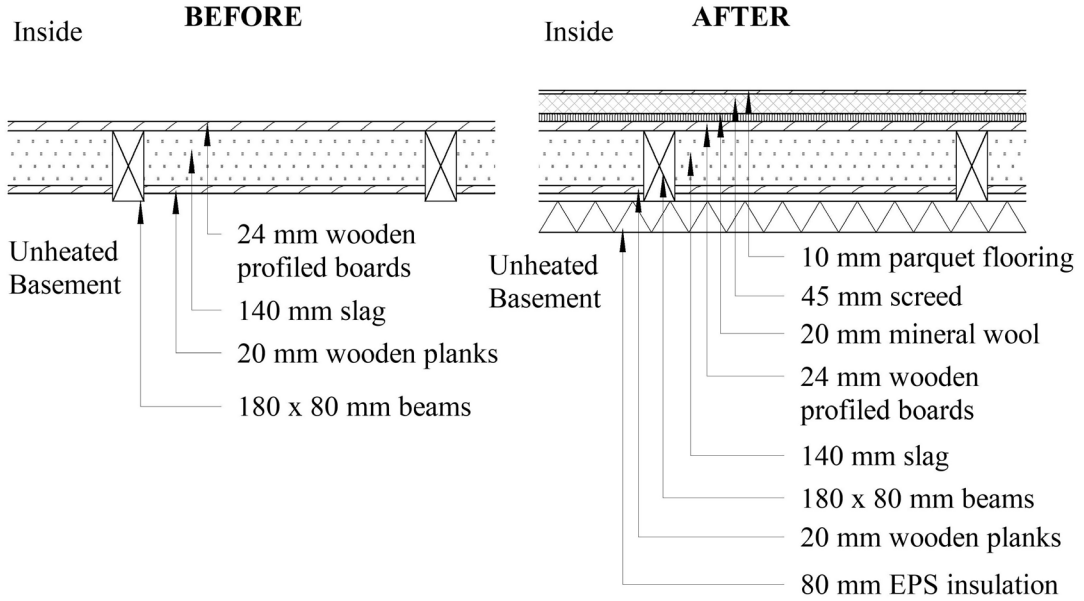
Cross-section view, ground floor slab towards basement, initial and retrofitted state.
